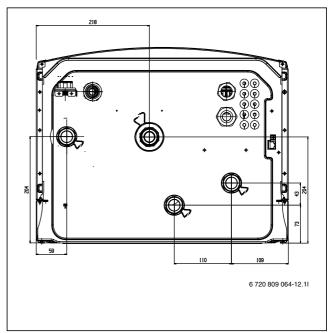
Heat pump module with immersion heater, dimensions in mm
